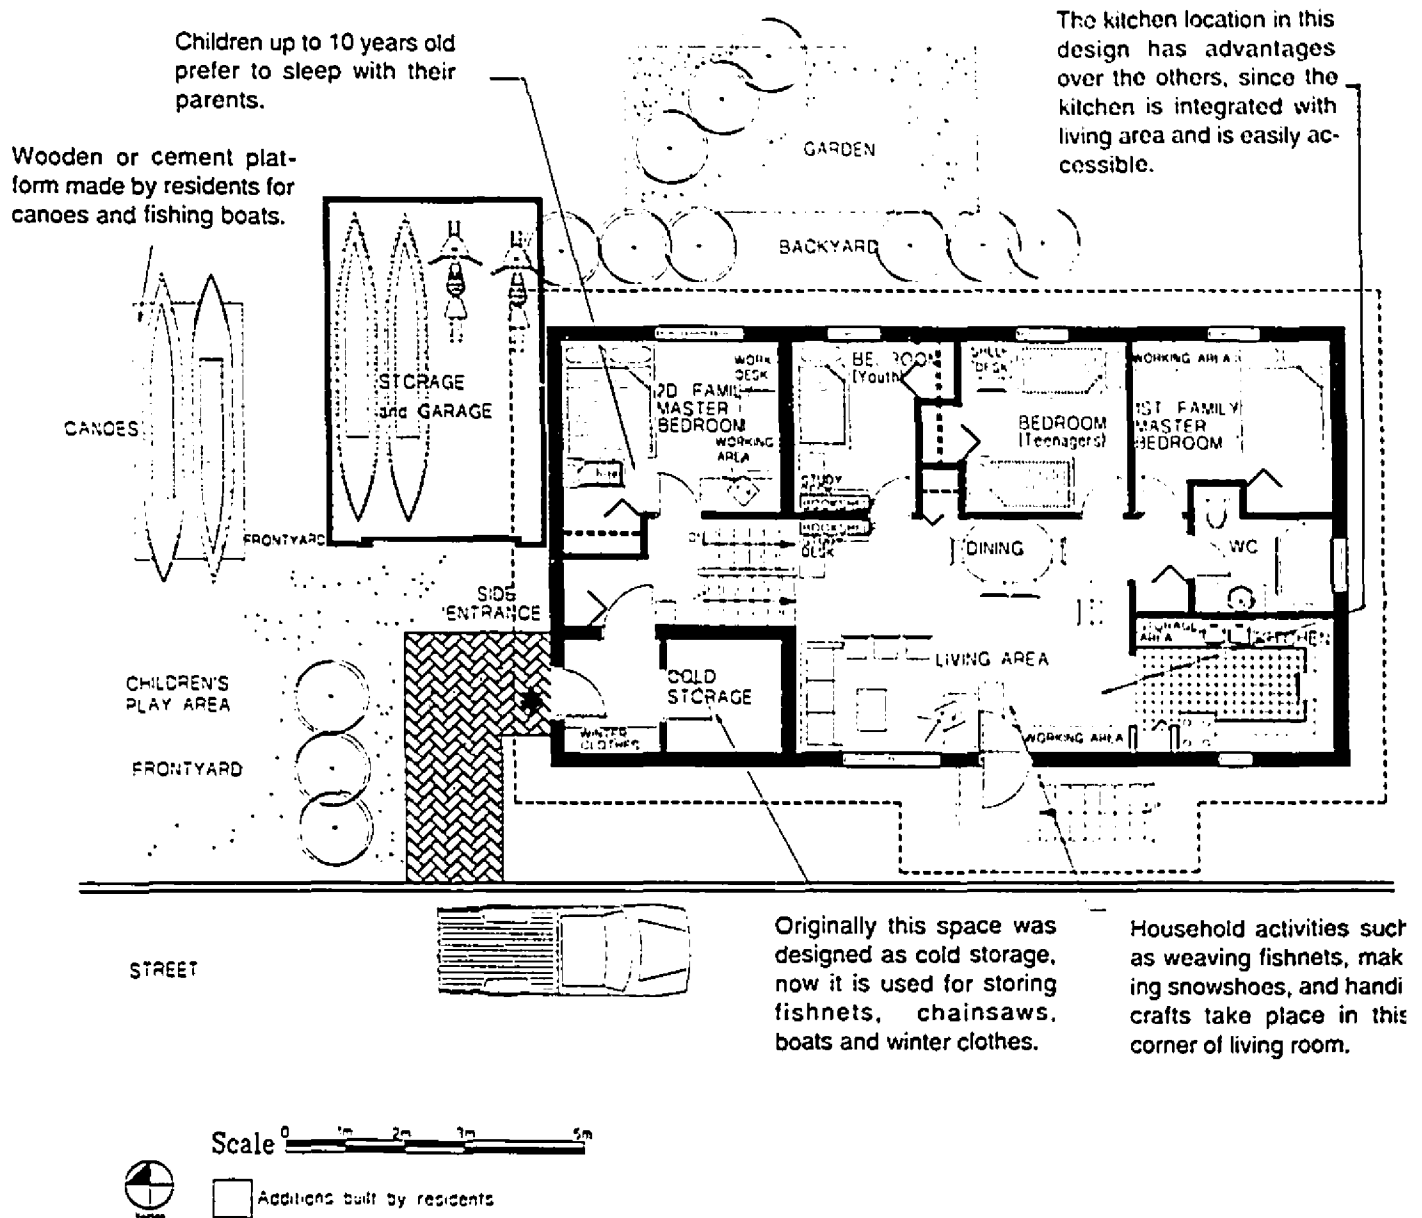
Additions and alterations by residents to a DINA house, (source of plan: the CHC, and observations of the author in September 1993).
